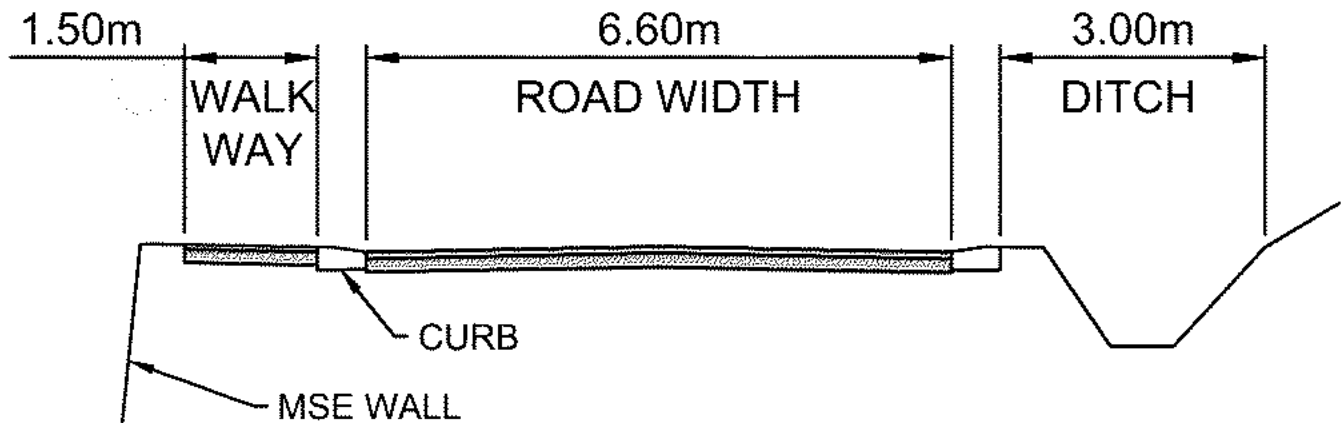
Typical Road Section in Proposed Pinnacle Ridge Development Subdivisions
